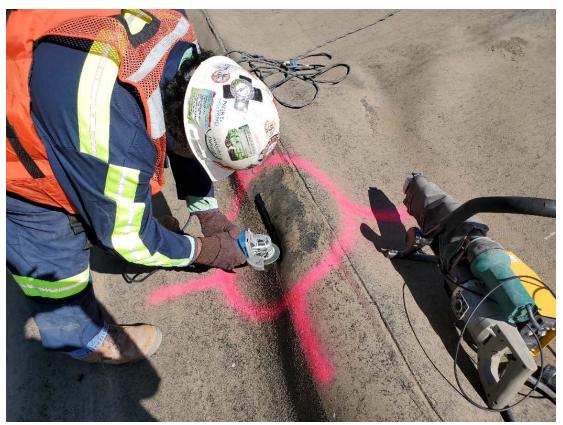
South Pond liner repairs – Northwest Linings technician abrading area to be welded
